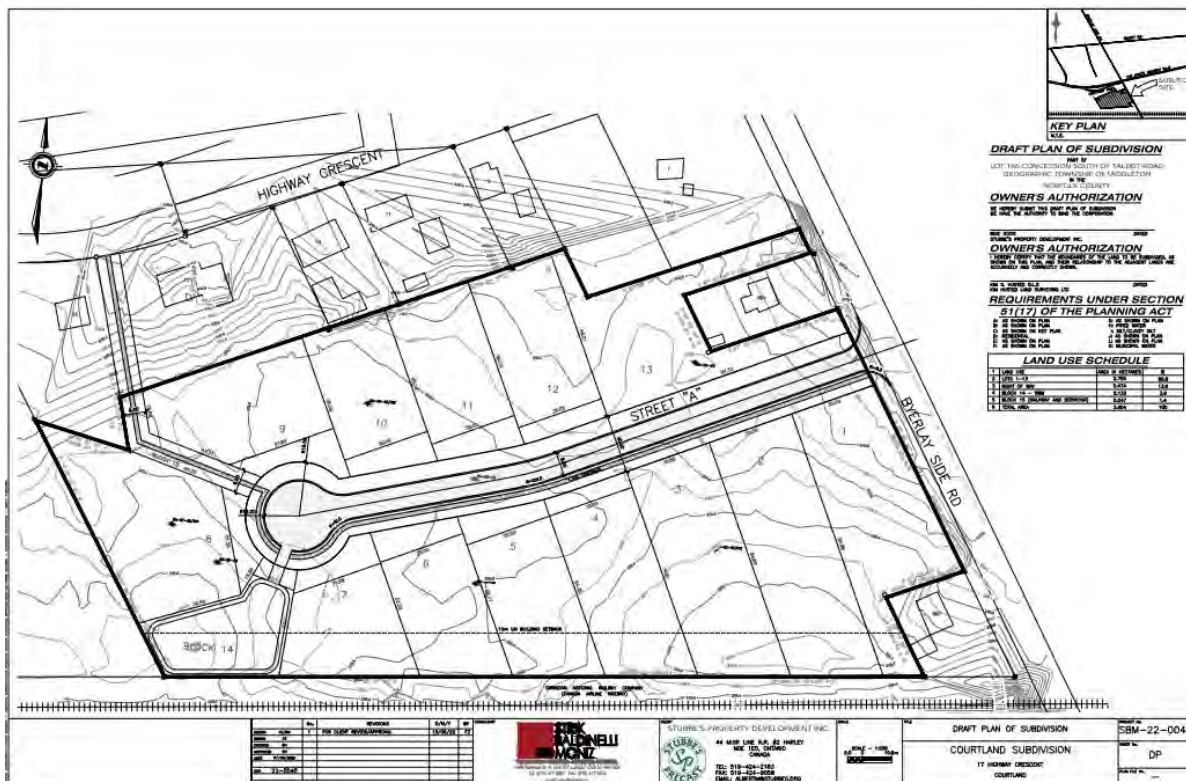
Preliminary Draft Plan of Subdivision: 17 Highway Crescent
